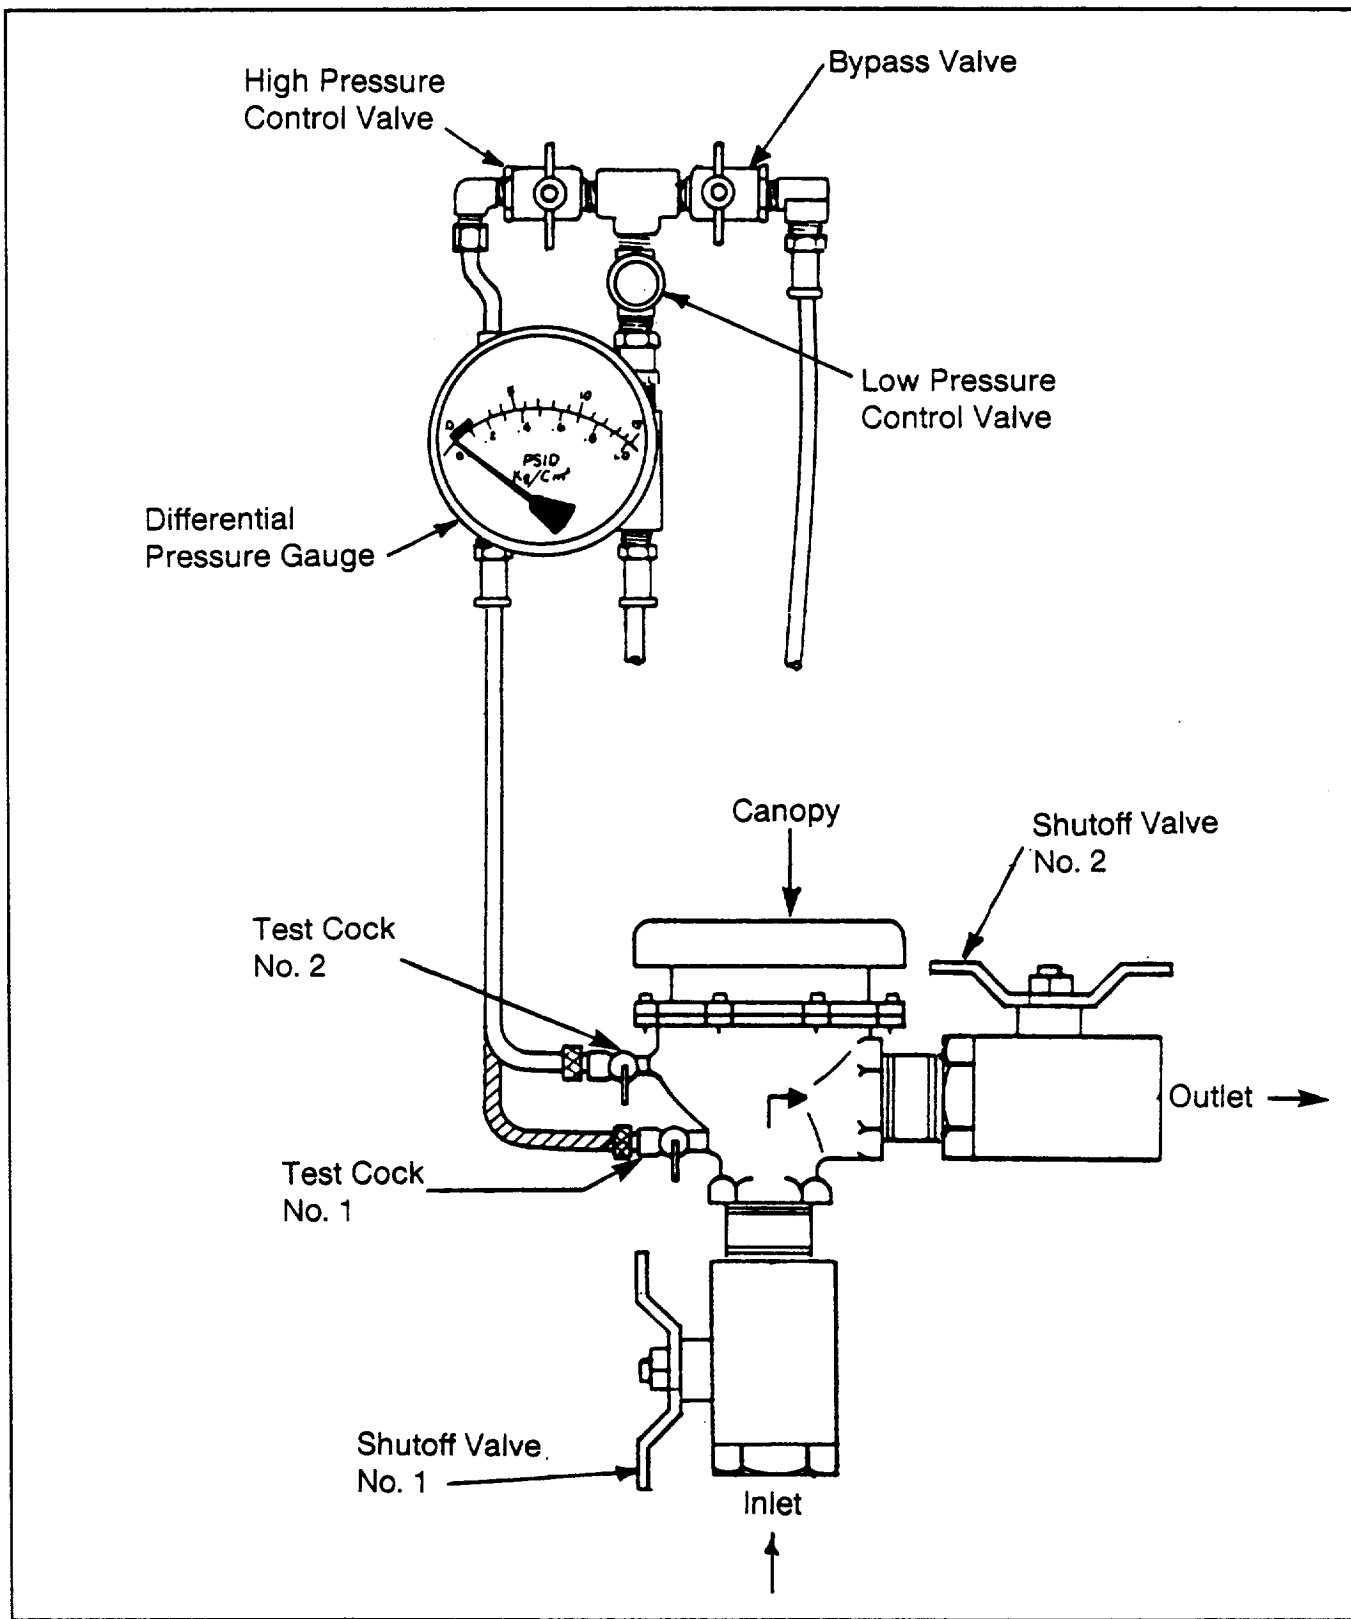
Setup For Testing Pressure Vacuum Breaker Assembly Using Differential Pressure Gauge.
